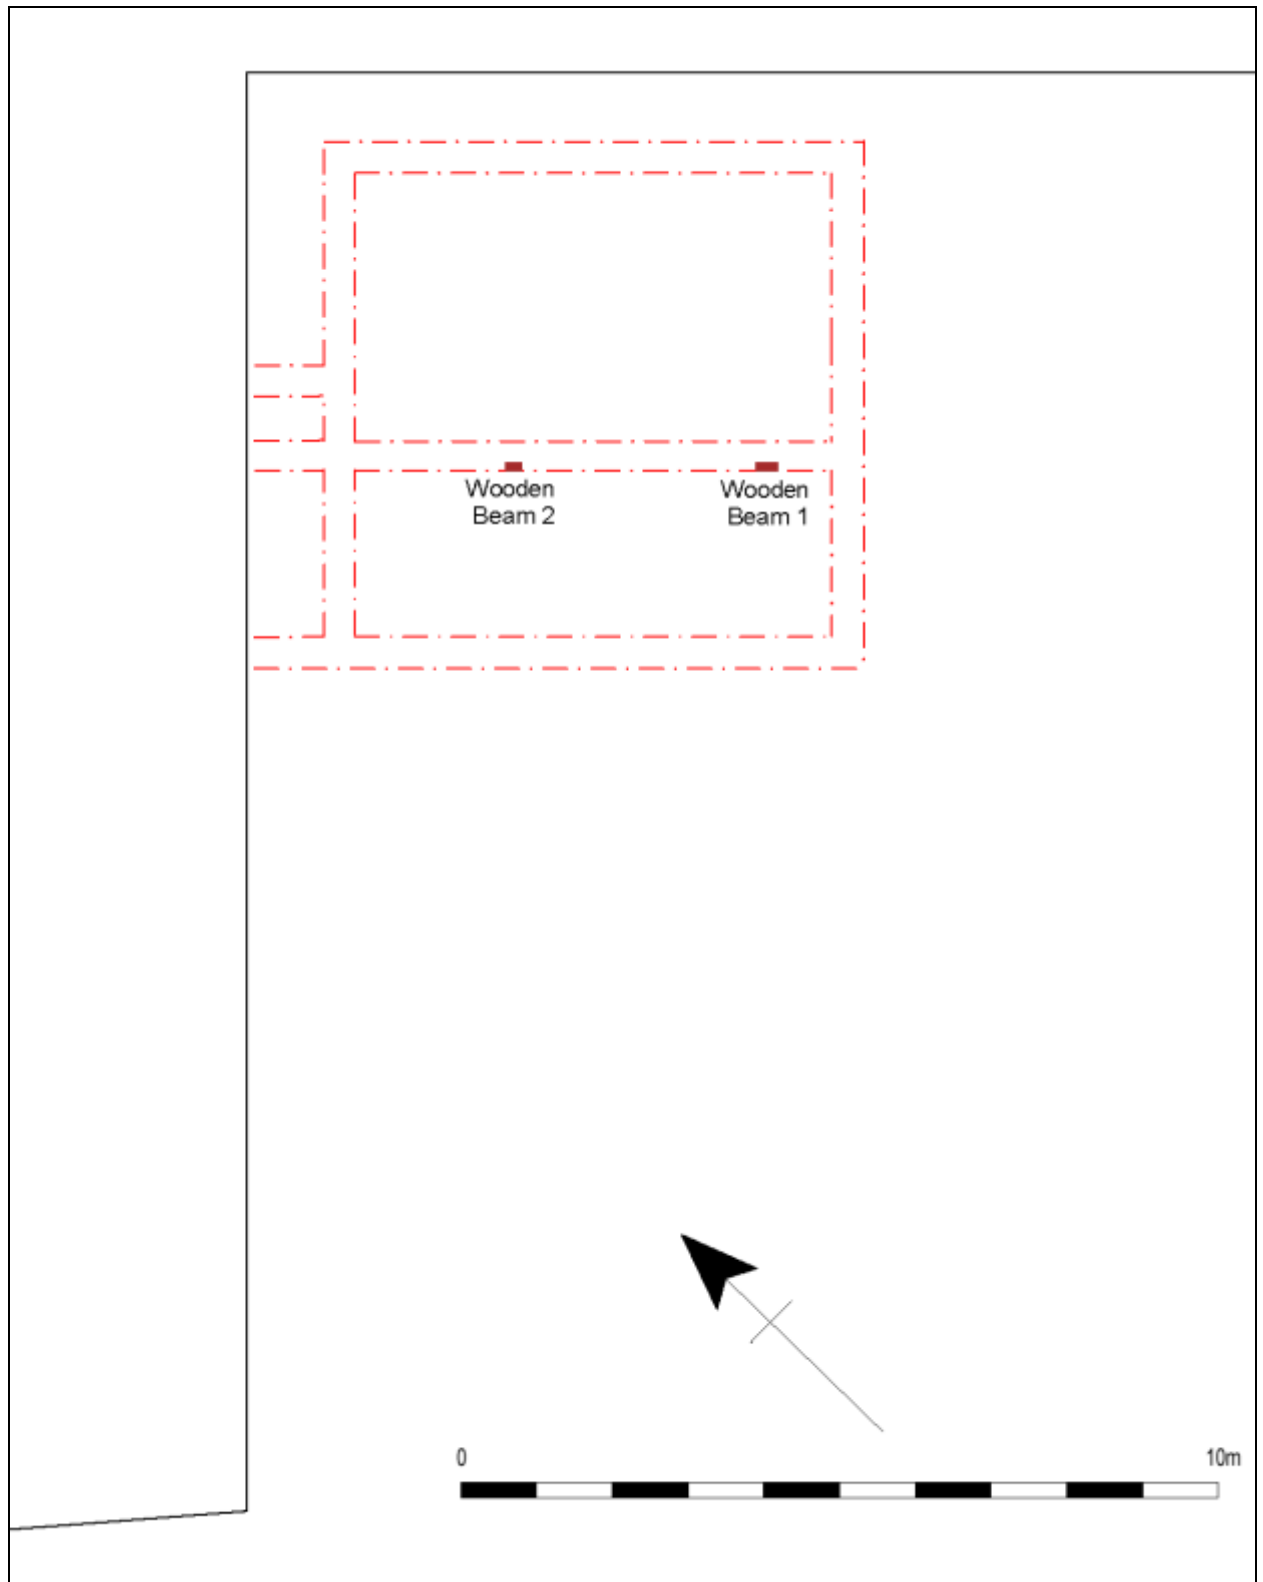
Plan of footing trench for the Unit 1 garage, showing the wooden beams (*scale 1:100*)
